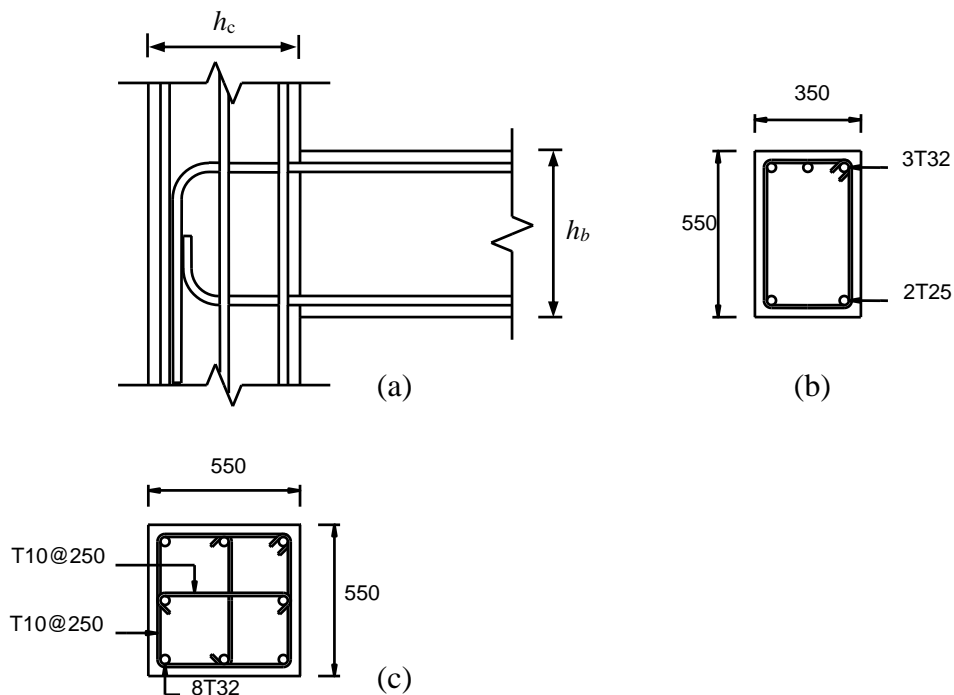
Exterior beam-column joint. (a) Beam-column connection; (b) beam cross-section; (c) column cross-section of non-critical zones
